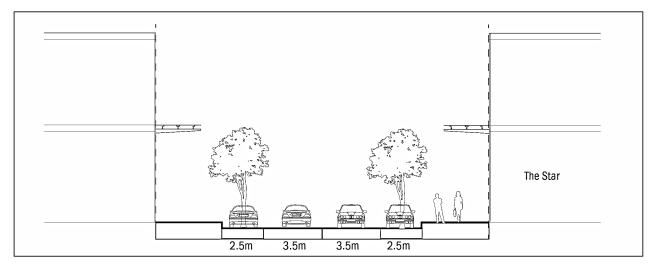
Site elevation / section 4: Jones Bay Road (Hassell)
